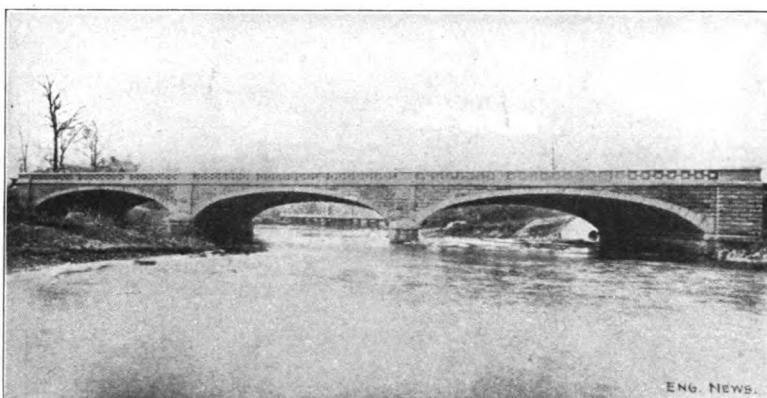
A Melan Concrete Bridge, Indianapolis, Ind.
